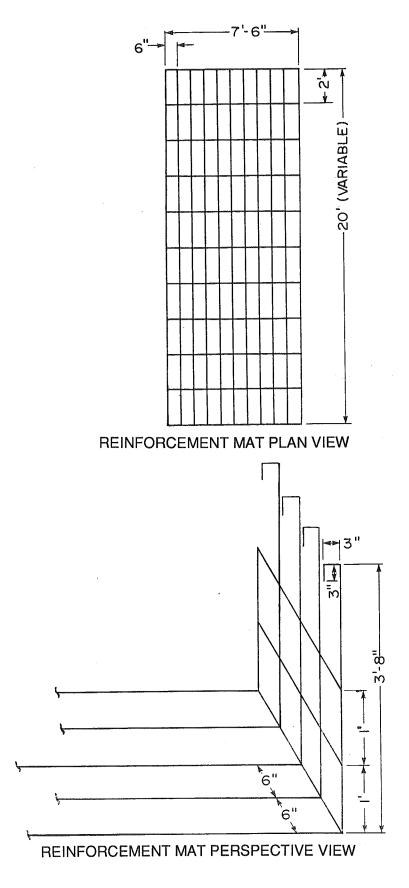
Typical Dimensions of the Horizontal Reinforcing Mats.
